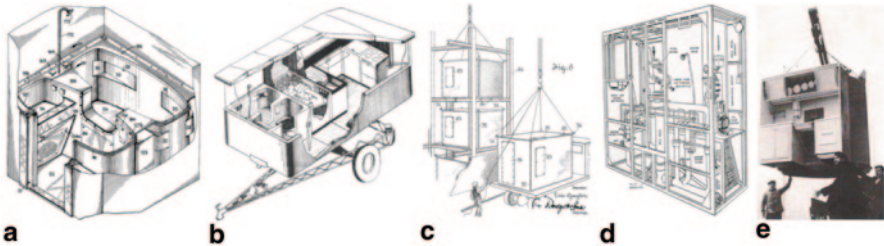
a Prefabricated bathroom, B. Fuller [17]. b Mechanical core (bathroom, kitchen, heating and lighting), B. Fuller [18]. c Prefabricated bathroom, Gugler [19]. d Ingersoll core bathroom and kitchen [2]. e Core bathroom and kitchen, Prouvé for the Abbé Pierre house [5]
